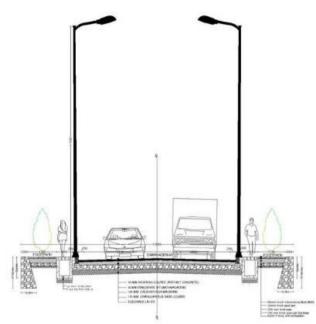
Typical Cross Section for 13m road (section Type C)
